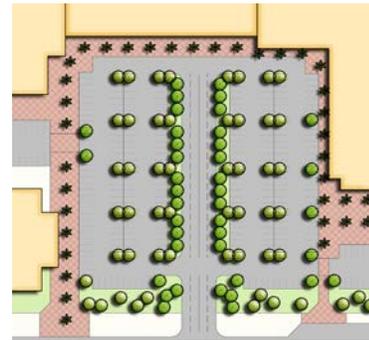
Pedestrian circulation is consistent along perimeter of parking lot.
